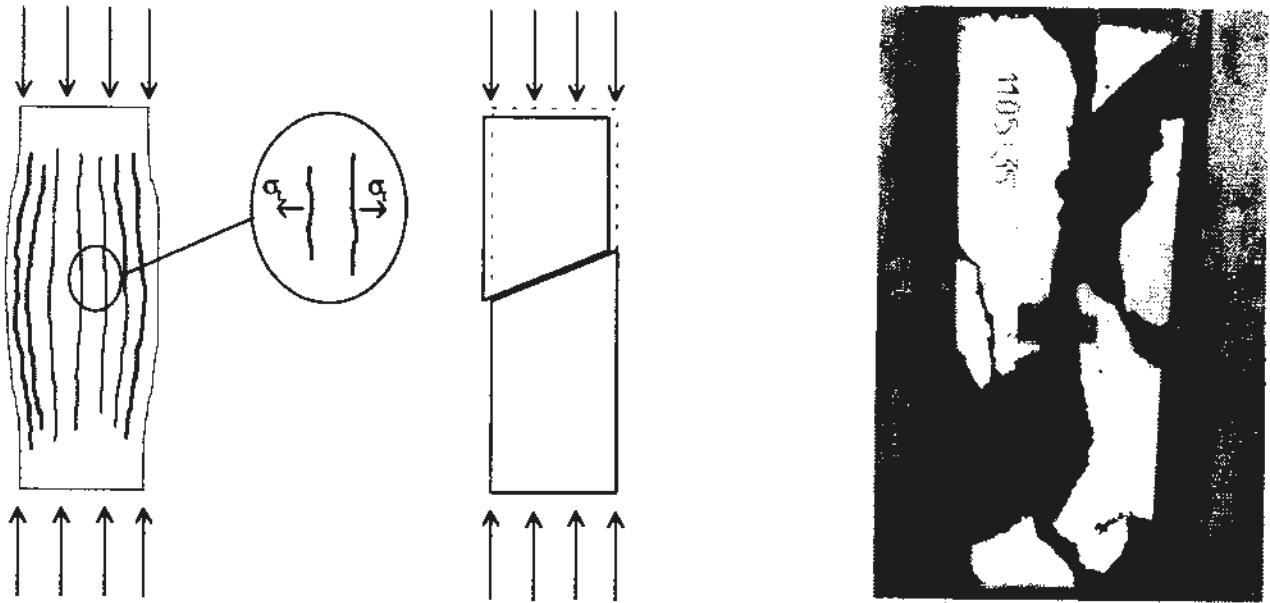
Longitudinal tensile cracks, sliding failure in a localized shear band, /11/, and a photo of an unreinforced concrete column (#23) after failure.
